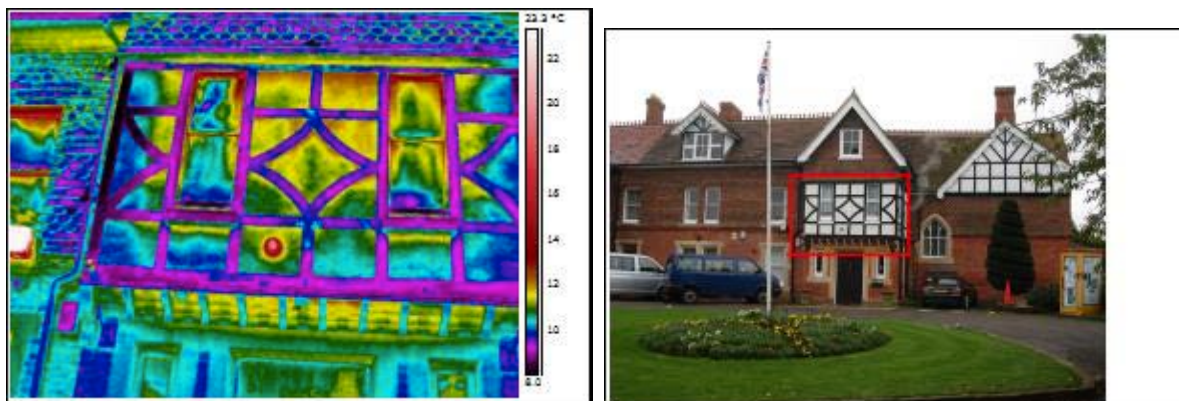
Front elevation (northwest). The image shows the heat loss through white painted wall. It is likely to be due to poor insulation of external wall.
